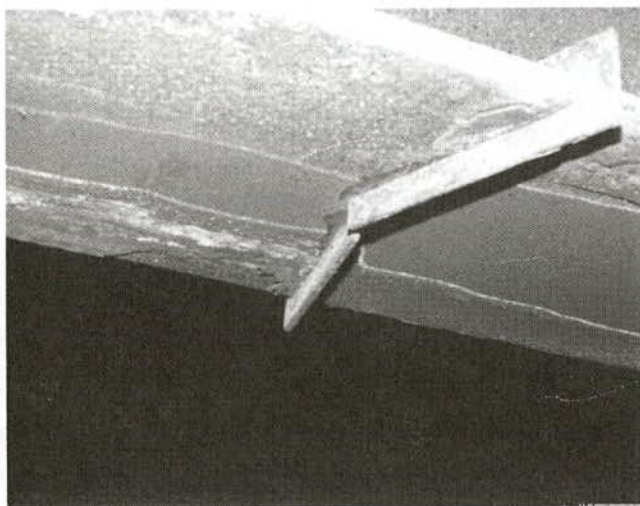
Water migration past drip plate by capillary action and through breaks in discontinuous dam. [Michigan Department of Transportation]
